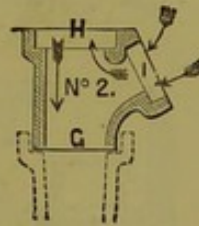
Section of "Connecting-piece" for Horizontal Air Inlet to Soil-pipe.
